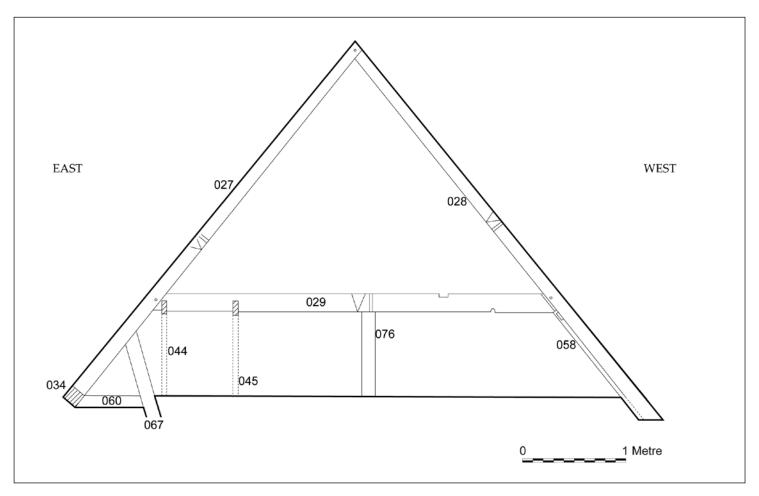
N Facing Section of Truss 7 in the Stair Loft
